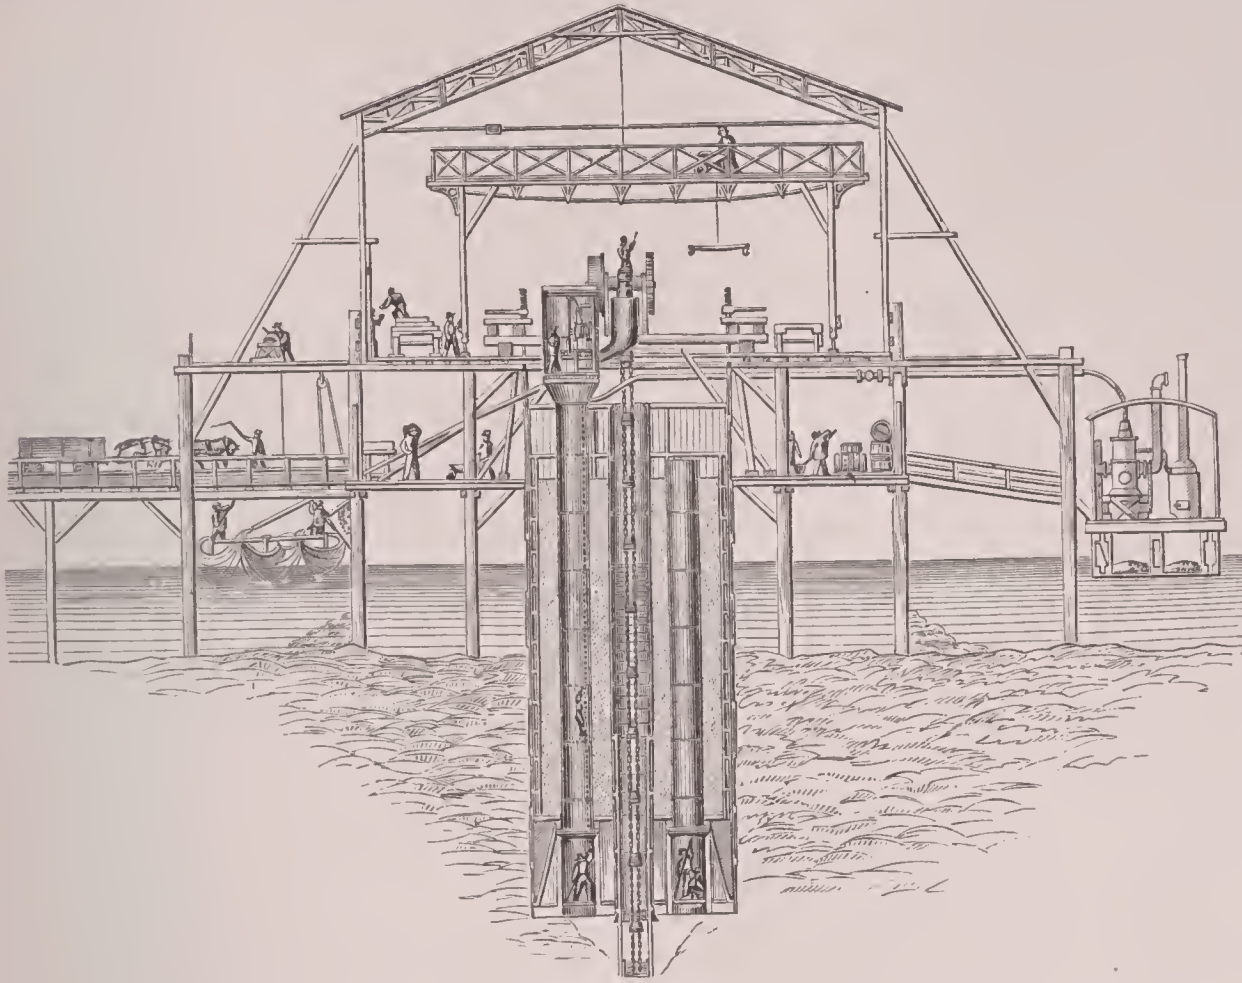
Cross-section : shore pier of Kehl bridge (French side).
